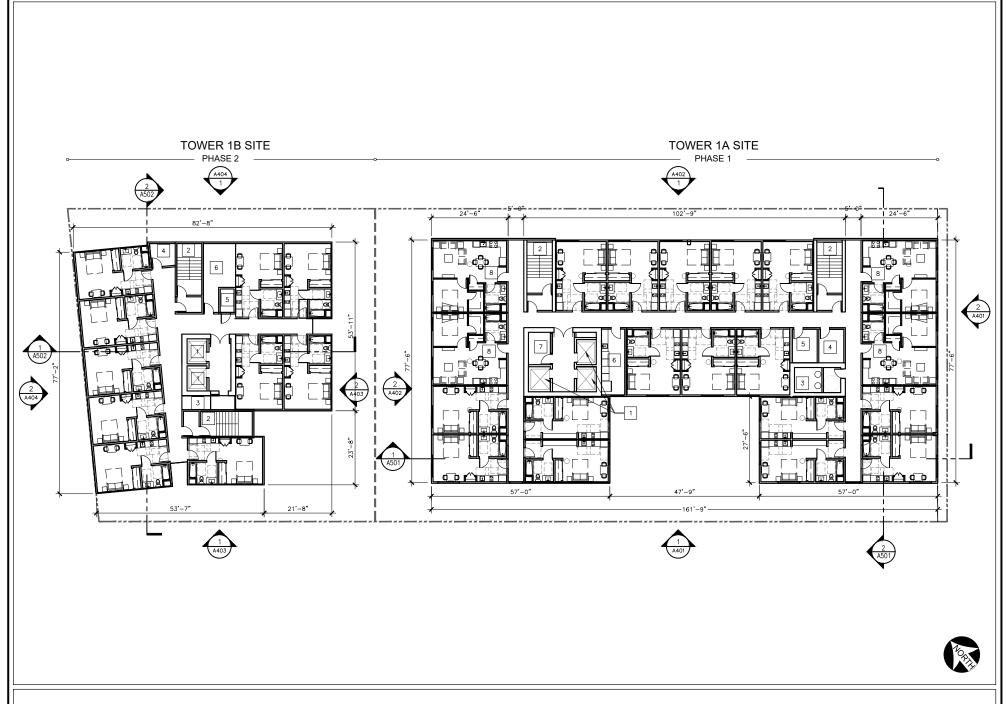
Level 10 and 11 Floor Plan - Site 1
